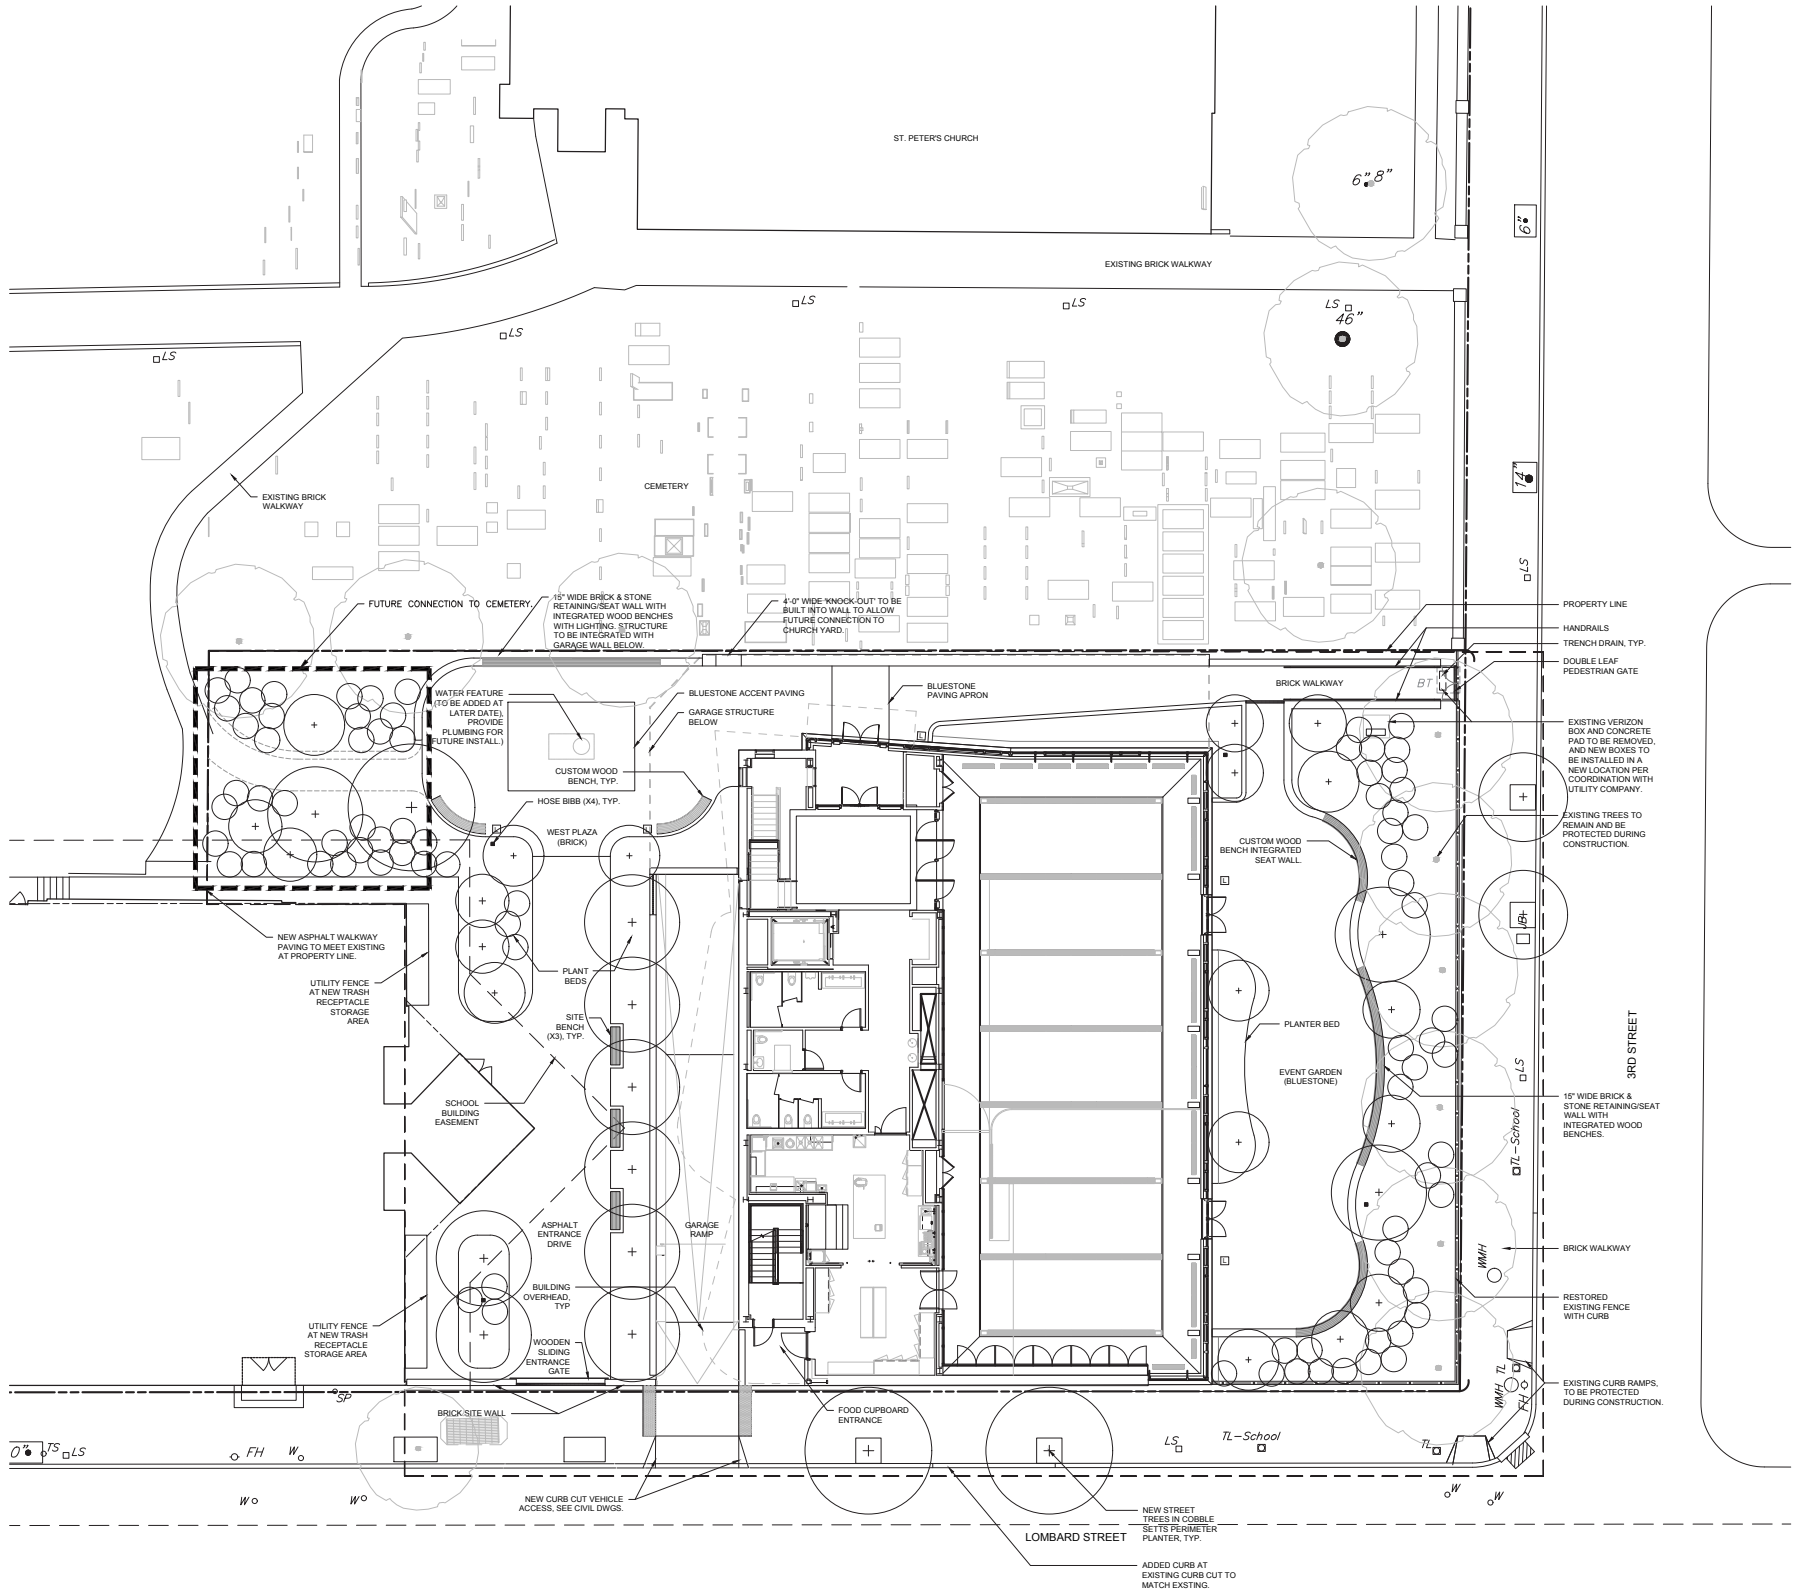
Site Plan Showing Limits of Archaeological Study Area (outlined). Scale: 1 inch = 45 feet (approximately). Source: Stantec 2015, Lot Consolidation/Subdivision Plan.
